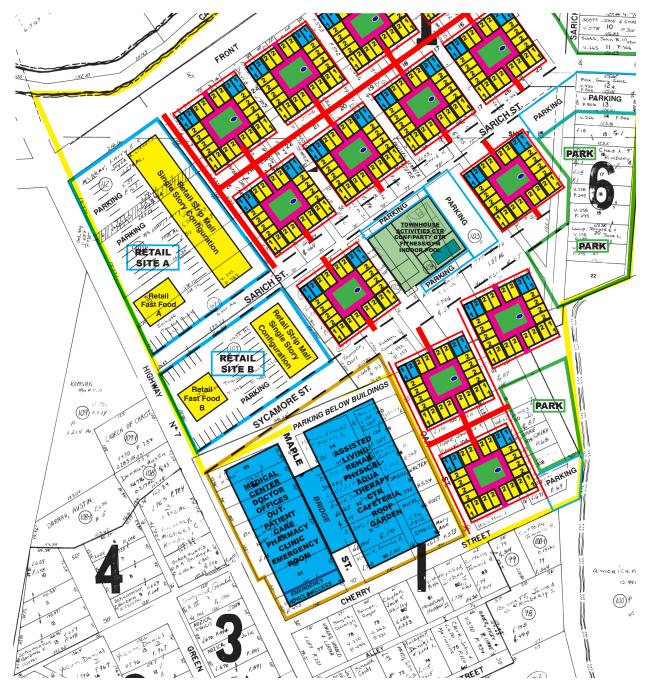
Powhatan Point Townhouse Village Proposed Medical Center and Retail Sites
